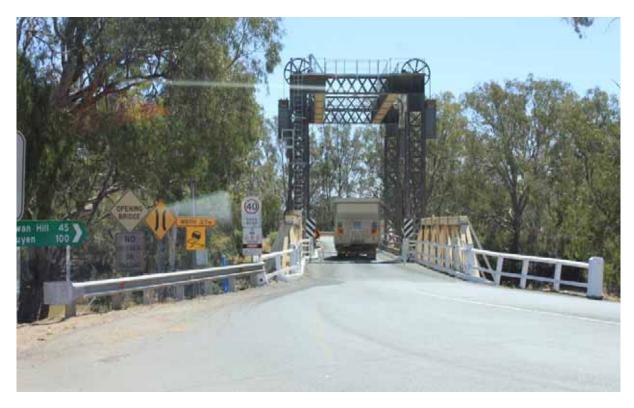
Balranald-Tooleybuc Road - Kyalite Road intersection (looking south from Balranald-Tooleybuc Road)
